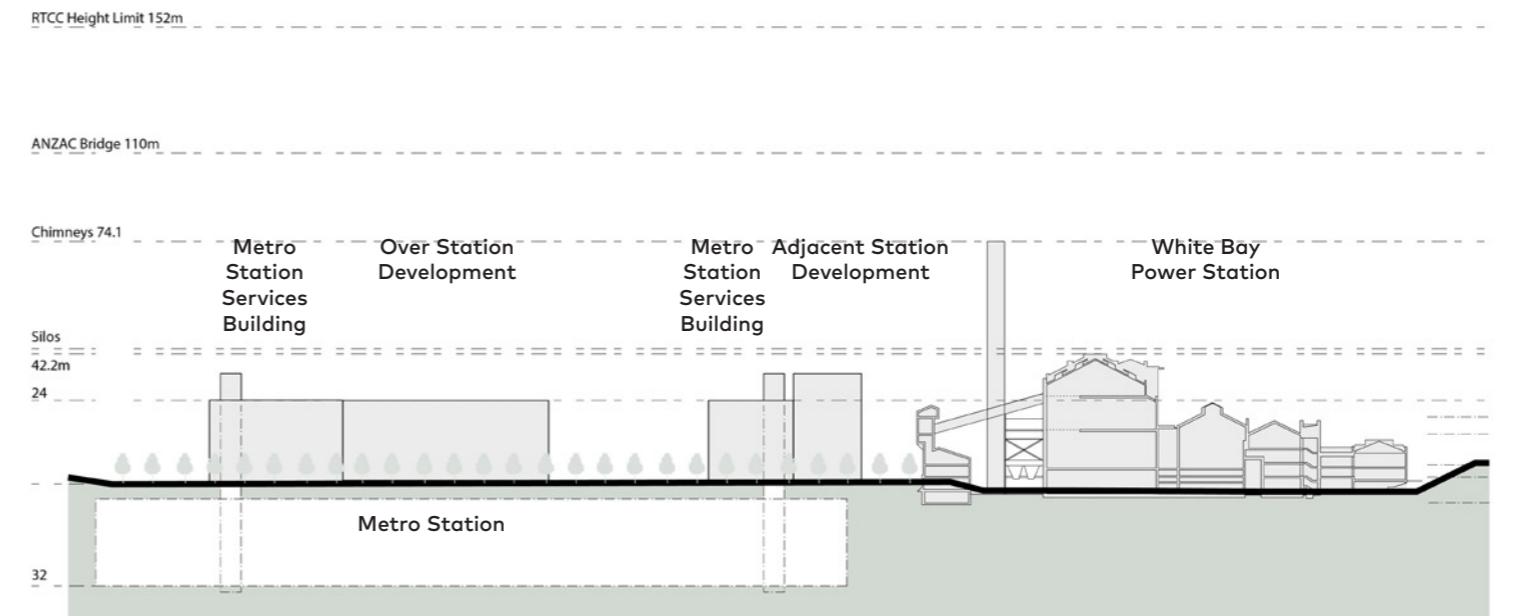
White Bay Power Station (and Metro) and Robert Street Sub-precincts section showing future Metro station and associated servicing
